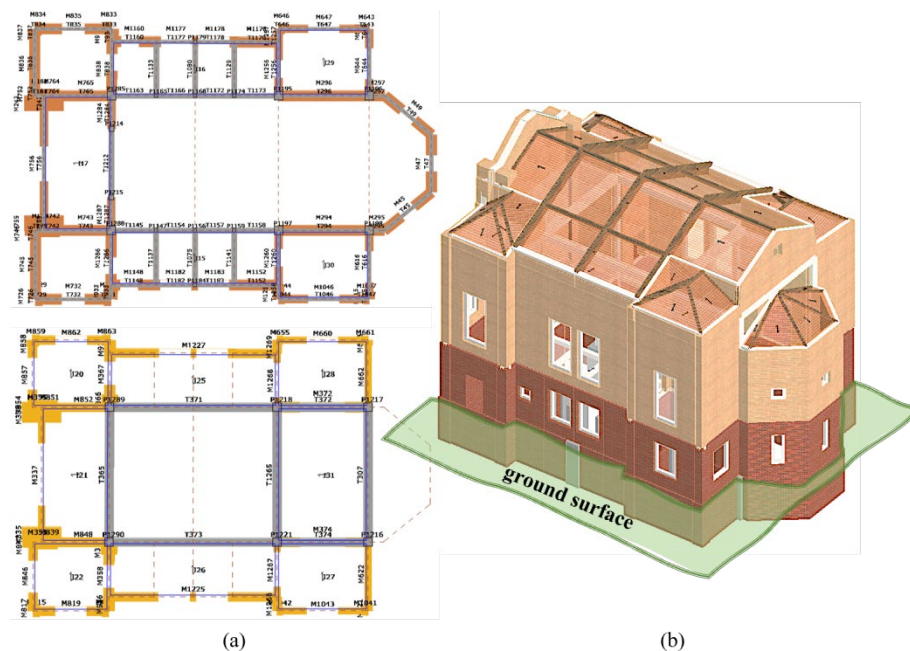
Added horizontal diaphragms on first floor (a) and attic level (b) and timber domes on the attic level (b).
